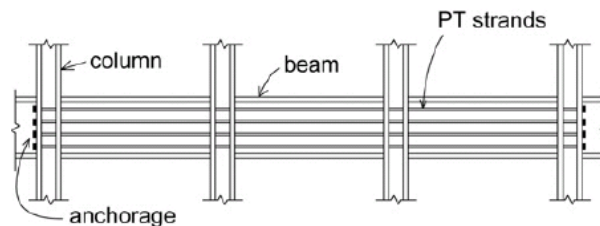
Schematic elevation of a self-centering post-tensioned frame
